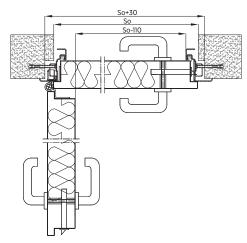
Installation of an opening frame with a thermal break using steel plates (optional)
